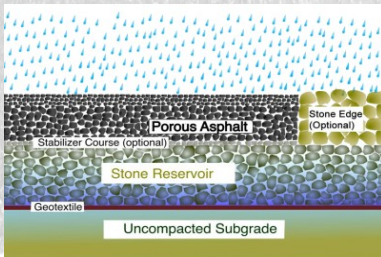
Typical porous asphalt pavement with stone reservoir cross section
